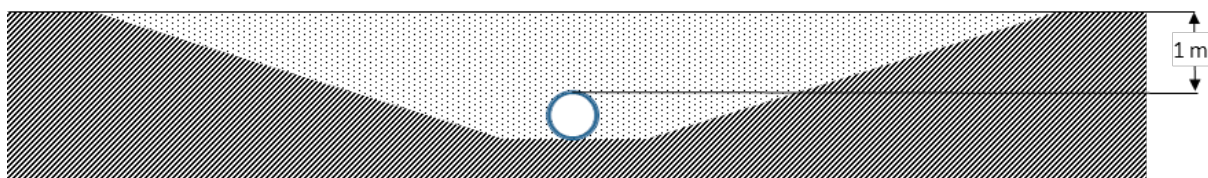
Pipeline trenching outside fairways (*Ramboll 2014a*).
